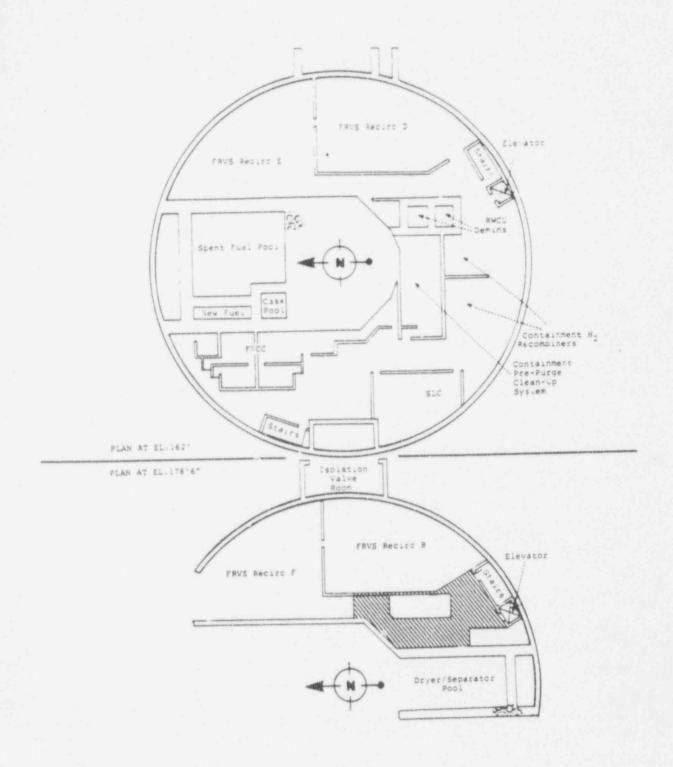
Equipment Location Reactor Building Plan-Elevation 162'-0" and 178'-0"
